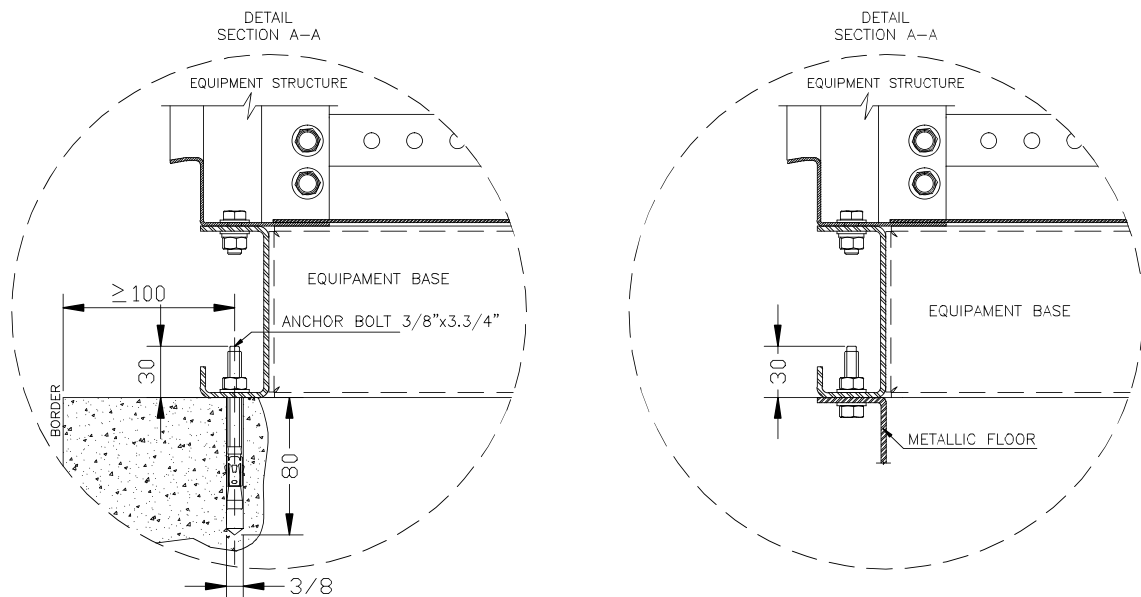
Details of the fastening of the panels to concrete floor and metal floor
